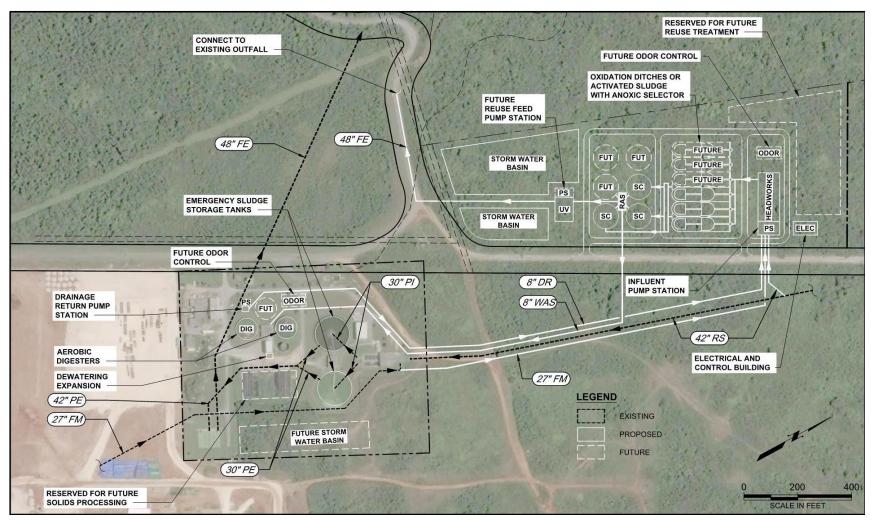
Northern District WWTP Facility Plan Recommended Improvements – Site Plan
